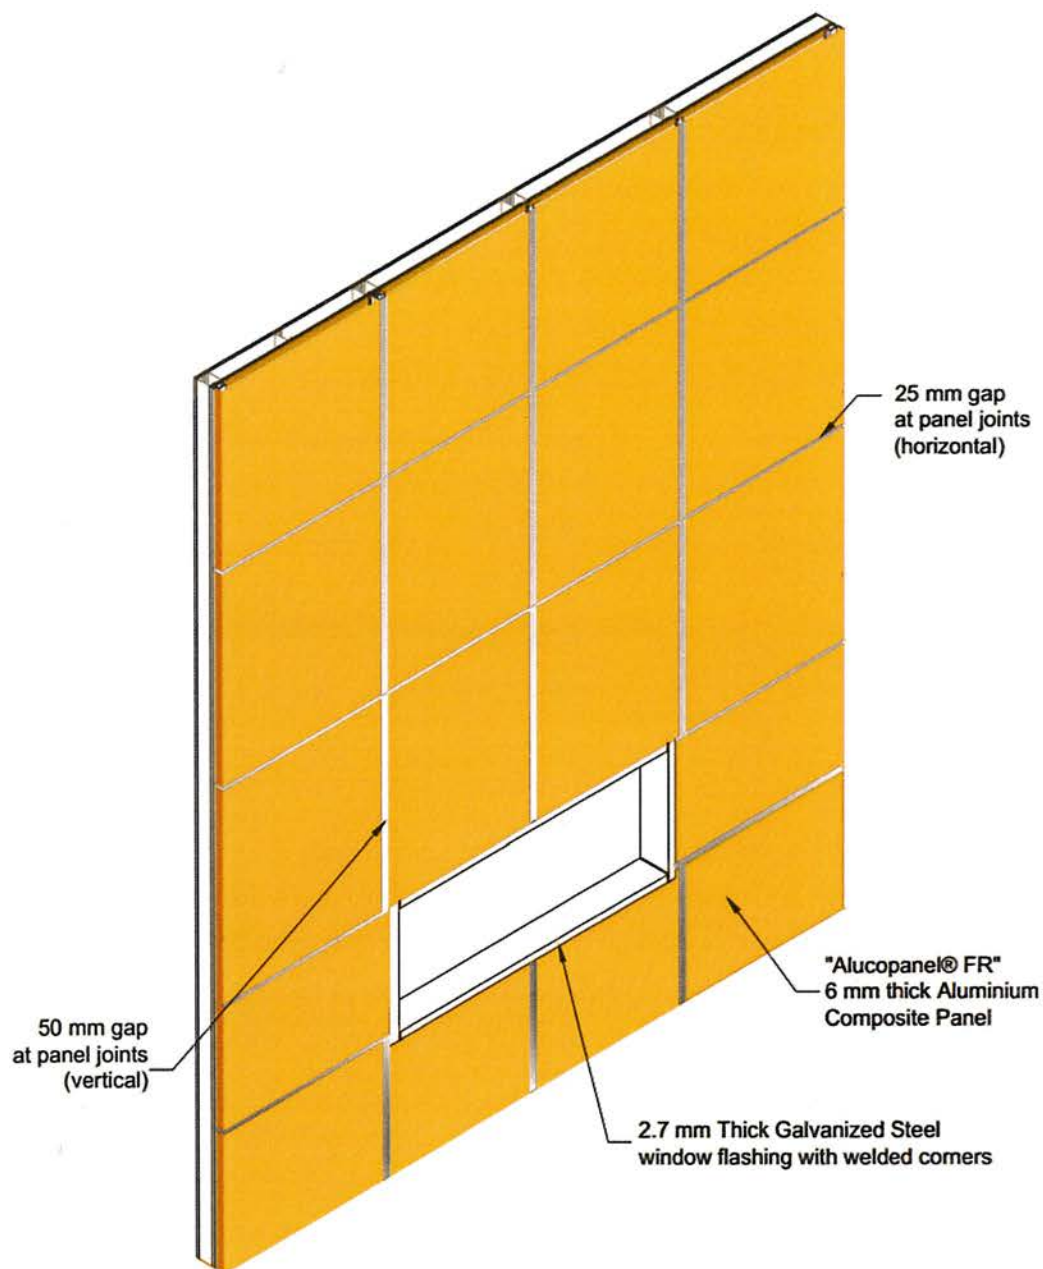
Aluminium Composite Panel Exterior Wall Cladding System - Typical Details
